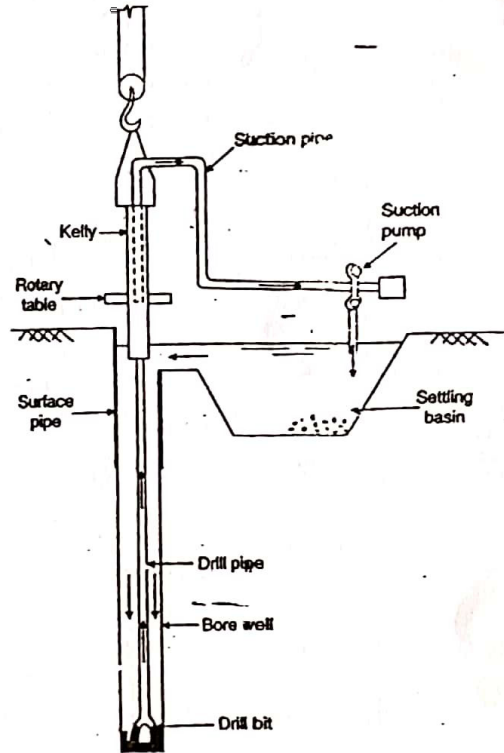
Hydraulic rotary drilling with reverse circulation (reverse)
